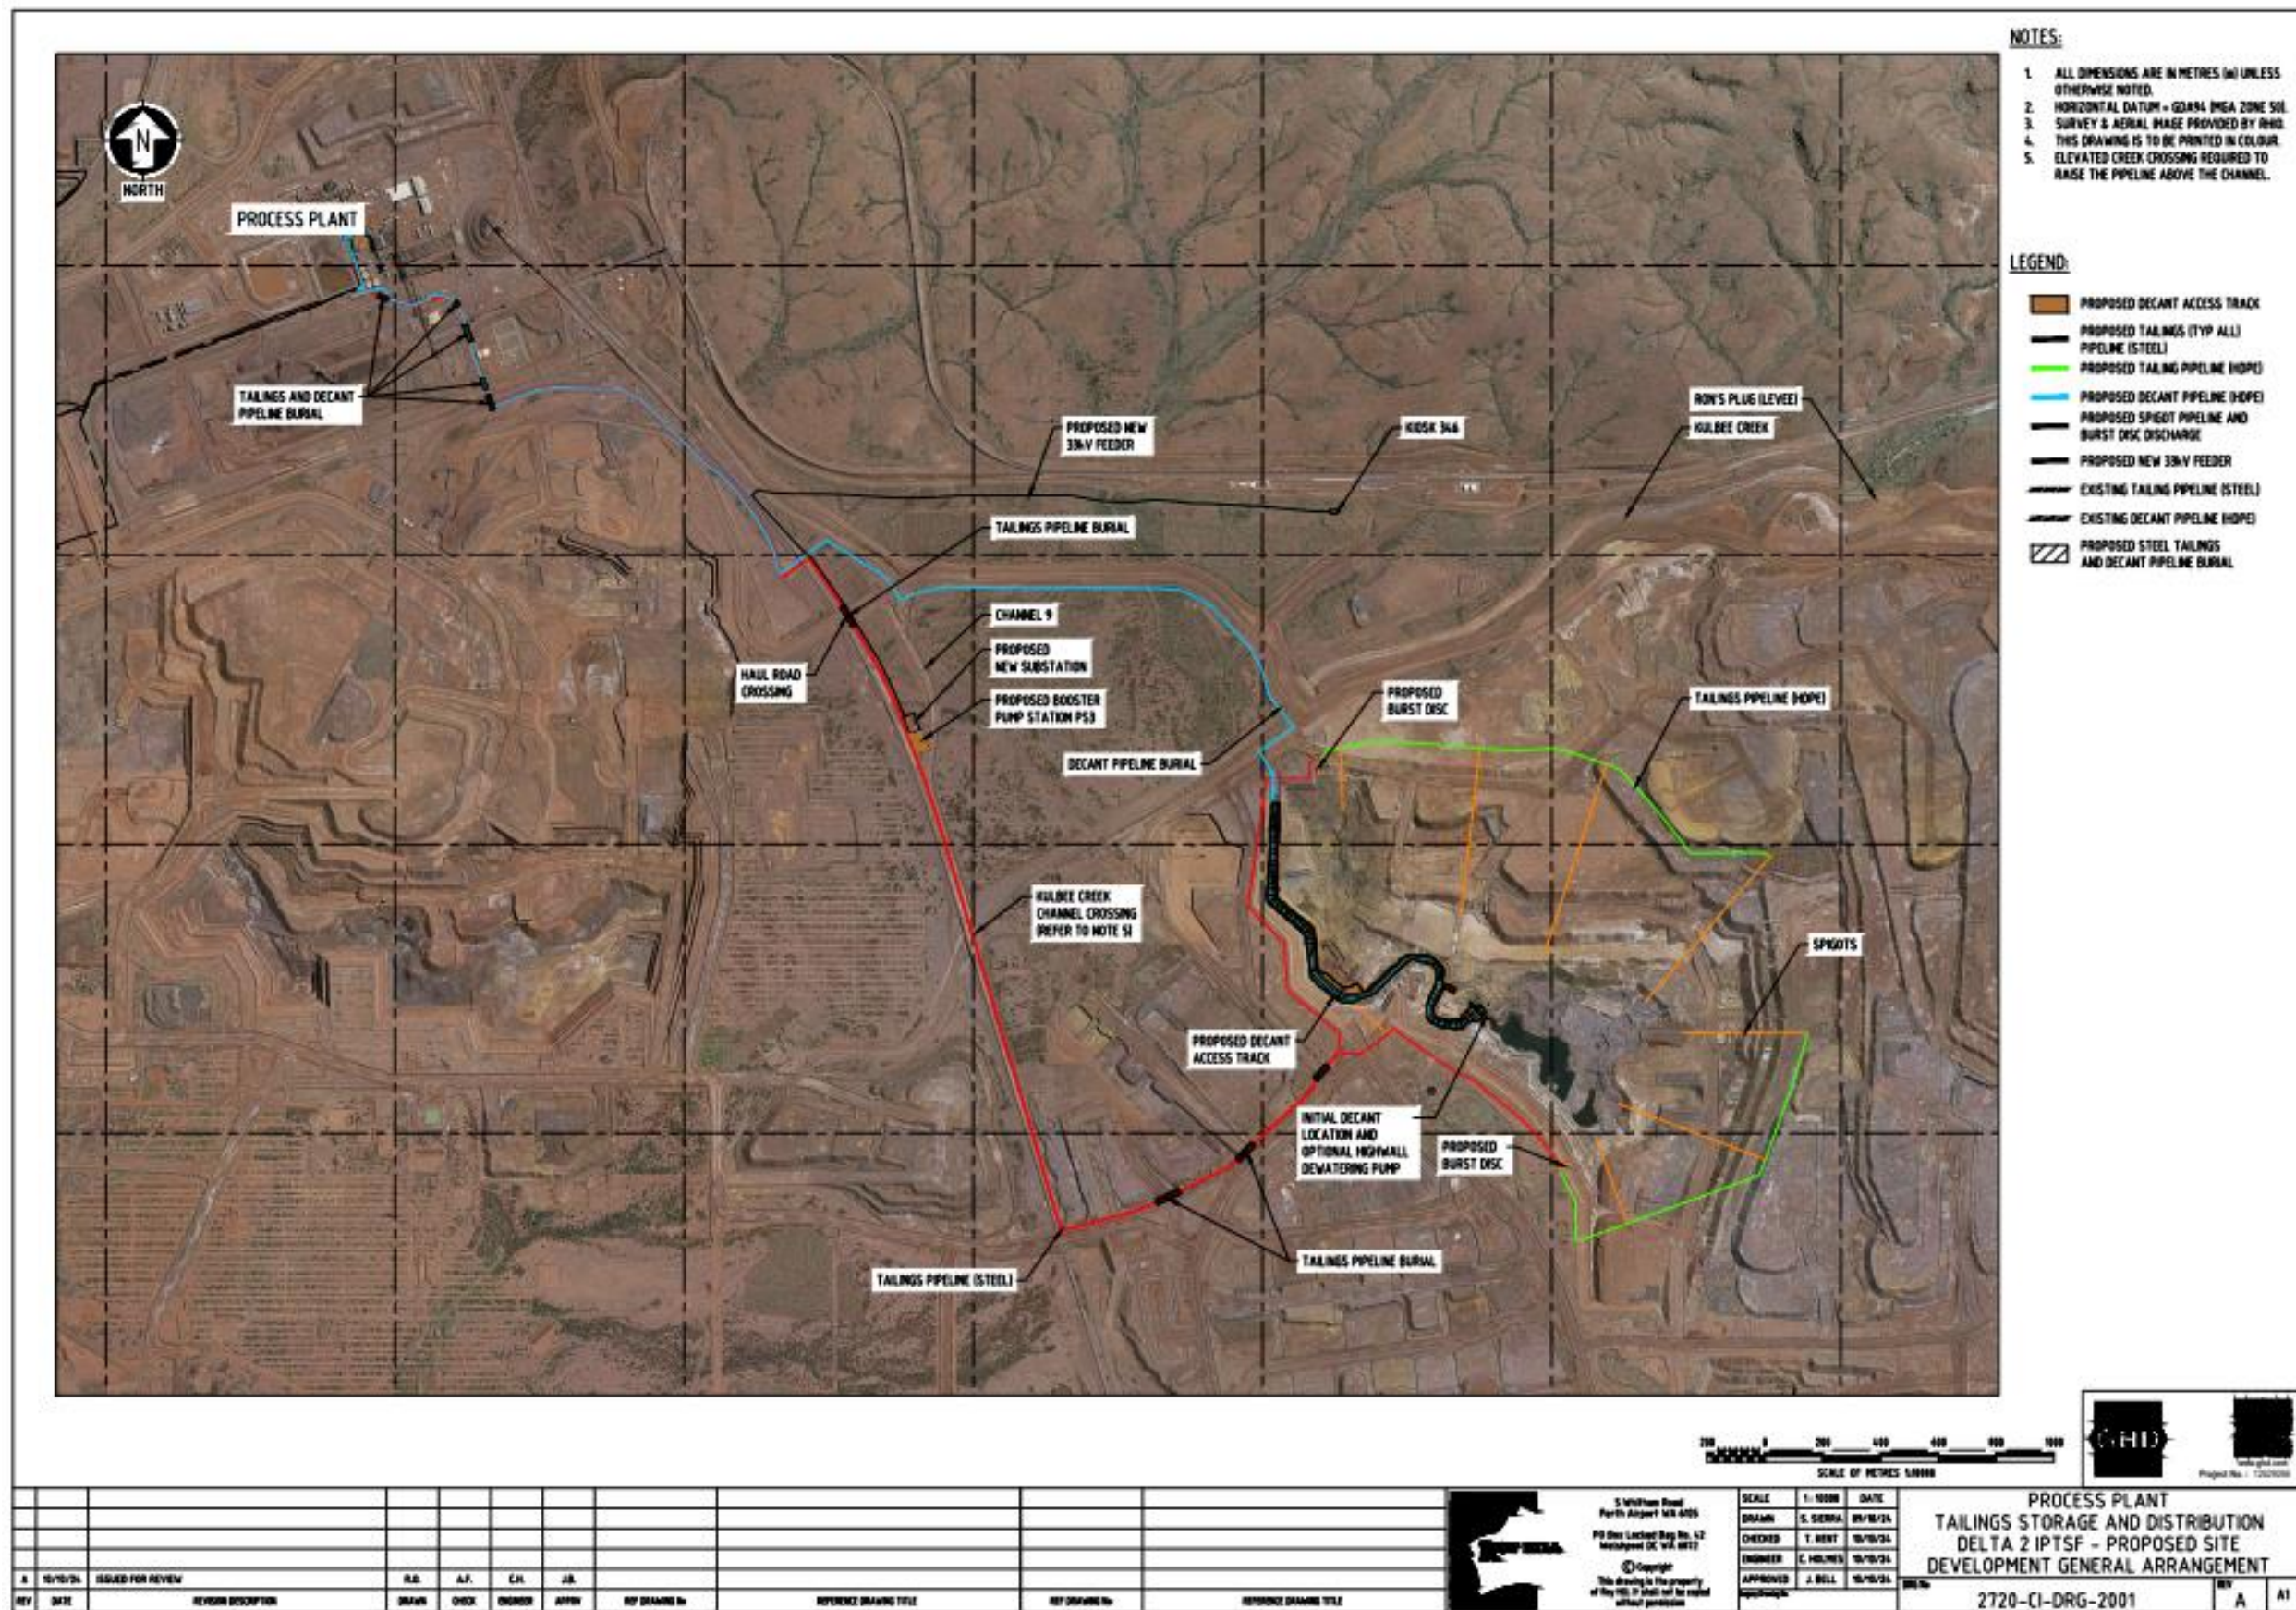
Delta 2 IPTSF proposed site development and general arrangement
